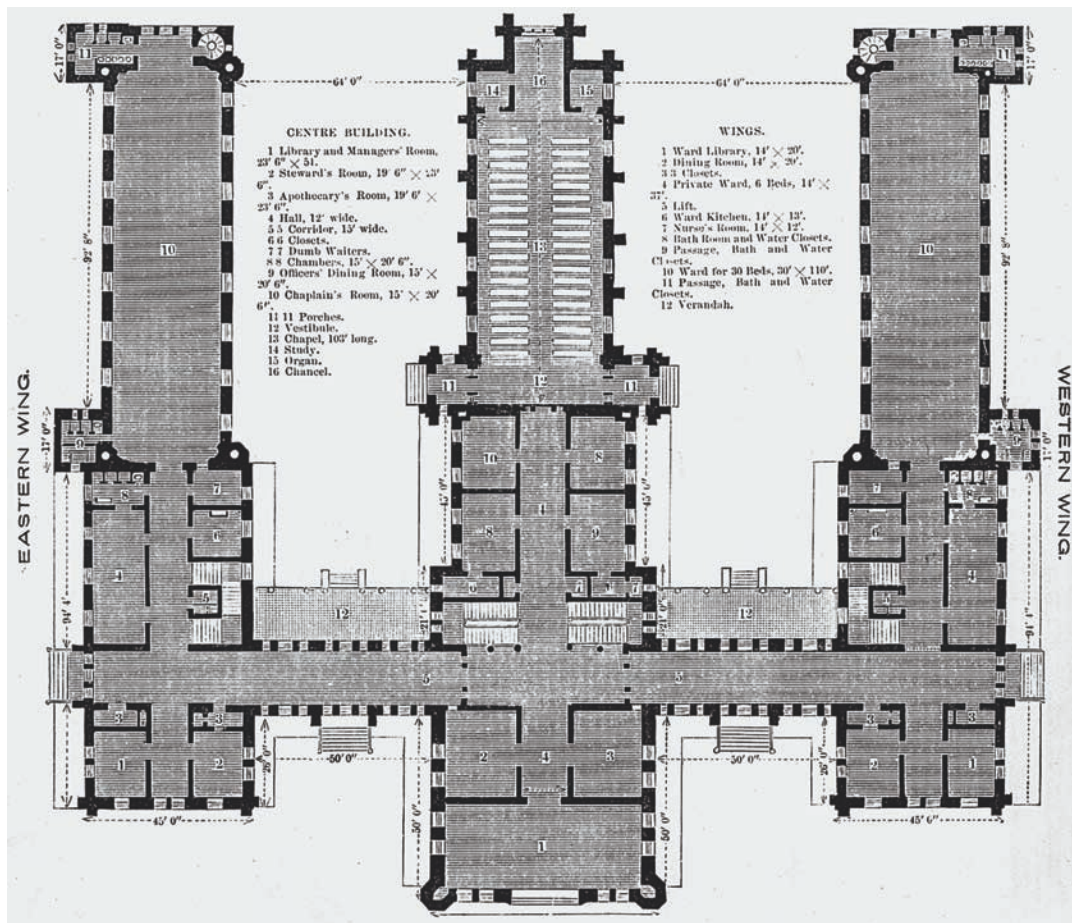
Hospital of the Protestant Episcopal Church in Philadelphia, plan in 1859. Initially only one ward wing and the administration wing of Samuel Sloan's master plan were constructed. The wards, which held thirty beds, included corner fireplaces to induce constant air flow up the chimney. The chapel was large, but did not have a direct connection with the wards. Each wing held a small (six-bed) private ward off the hallway, as well as the usual accessory service spaces. The dining room and library across the hall from each ward were for convalescent patients.
